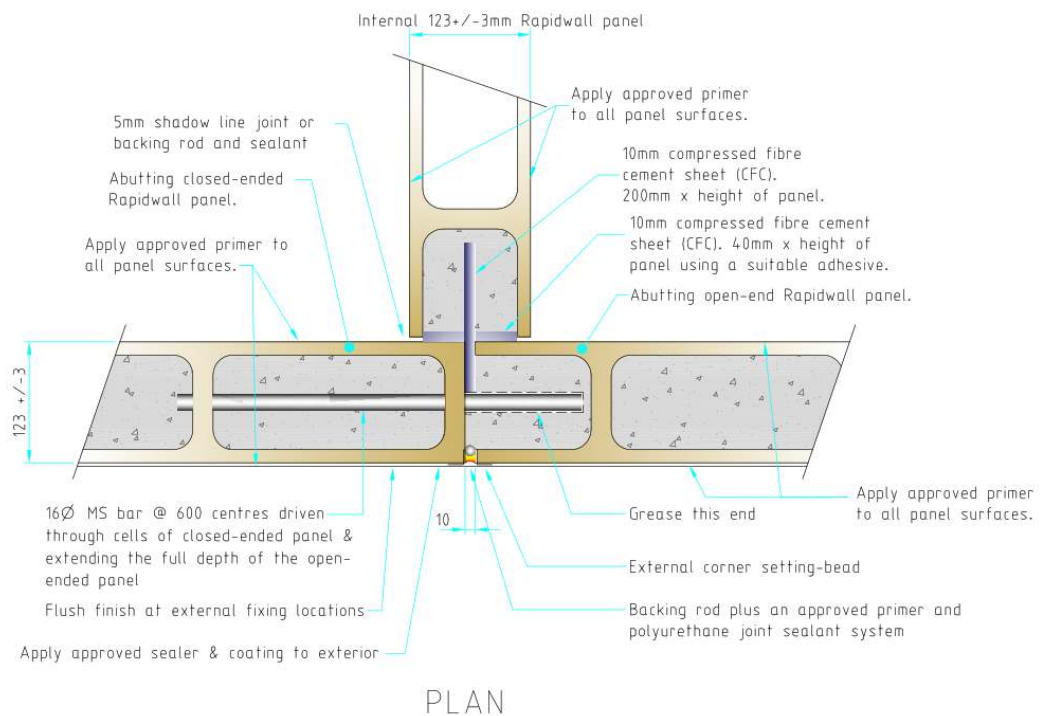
Blind Control Joints T inter section Concrete filled panels
